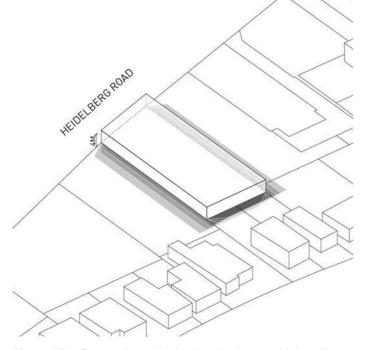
Extent of overshadowing of a 4 metre high wall on boundary. The overshadowing impacts are minimal.
